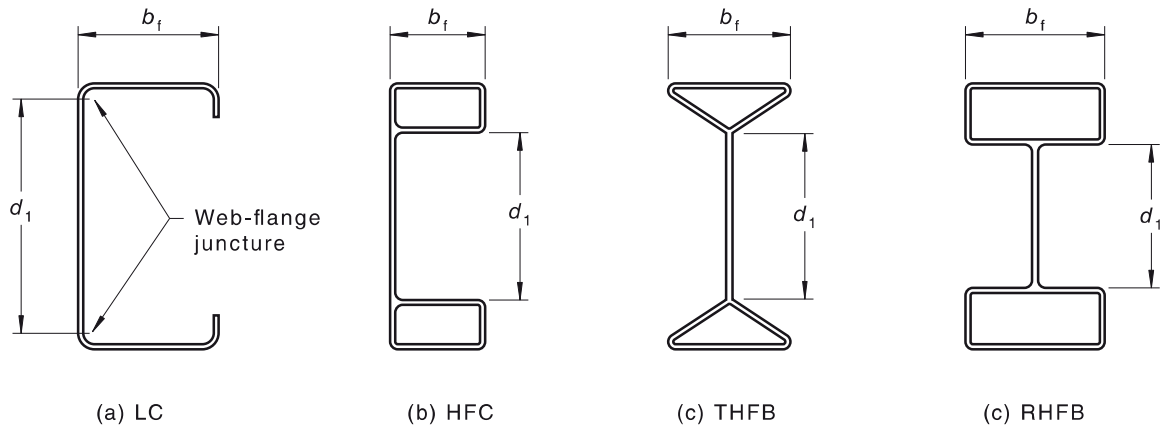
HOLLOW FLANGE AND OPEN COLD-FORMED STEEL BEAMS
